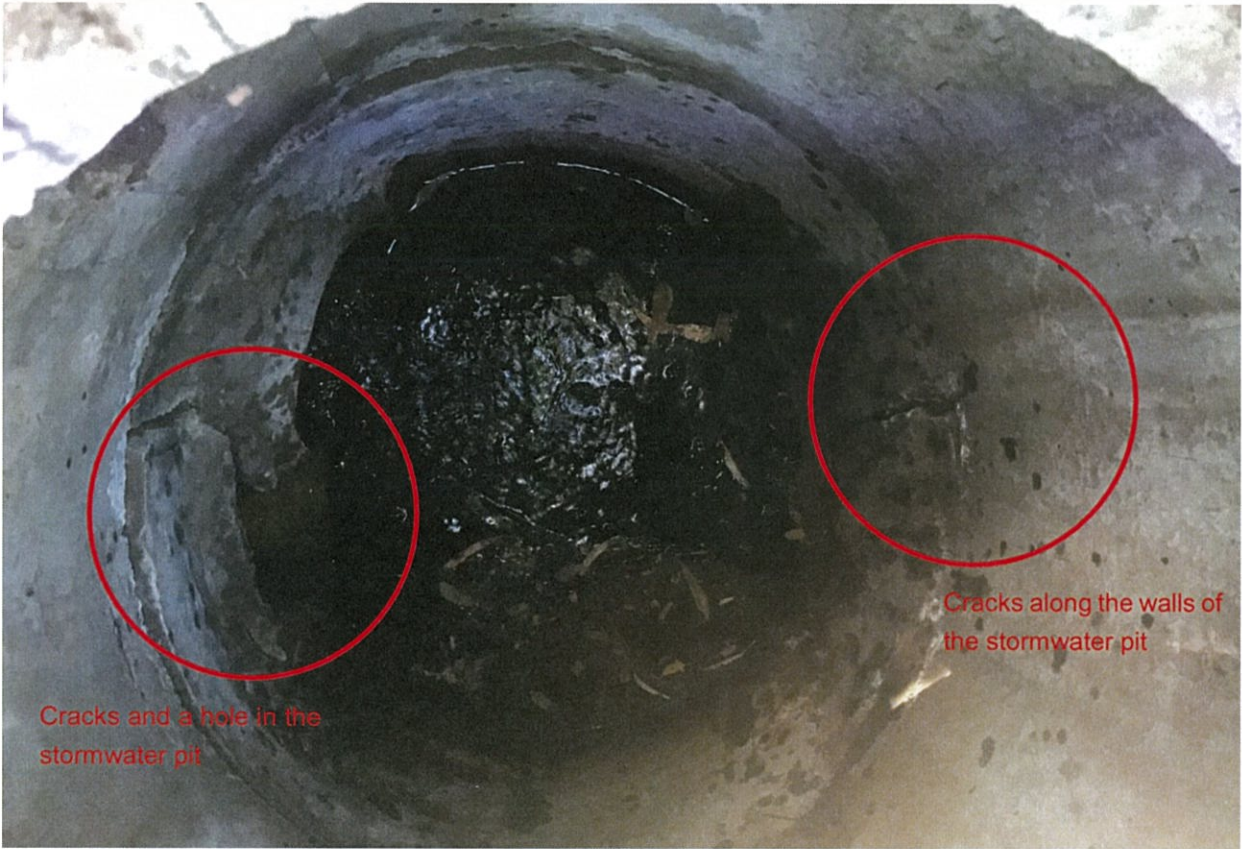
Image of cracks in stormwater pit that requires patching and sealing
